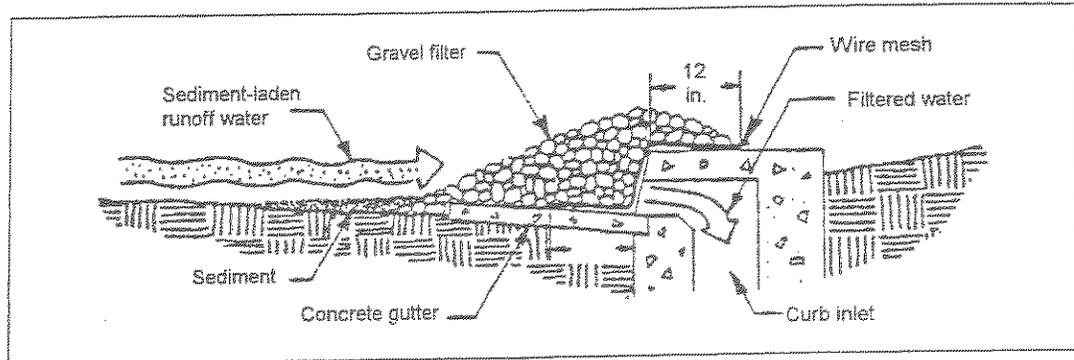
C. Cross-section detail of a gravel curb inlet protection.
